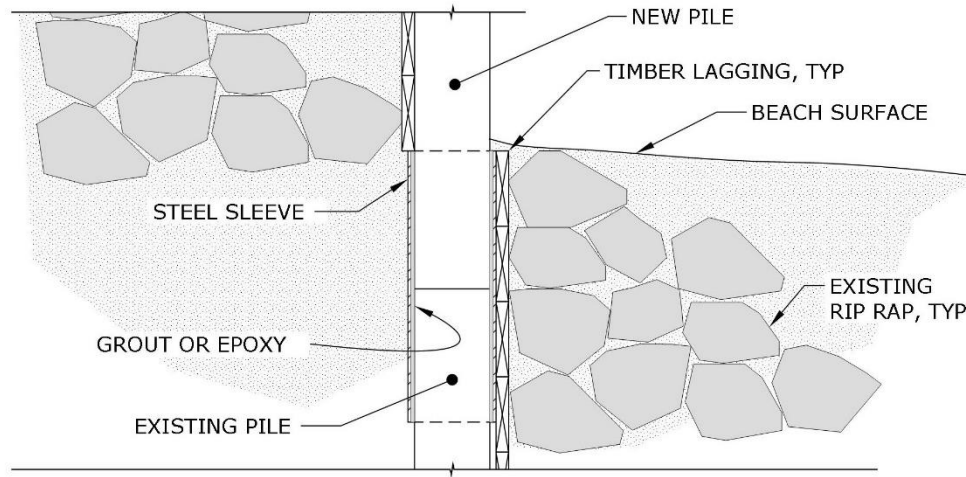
Conceptual detail depicting a below-grade splice of a sea wall pile.
